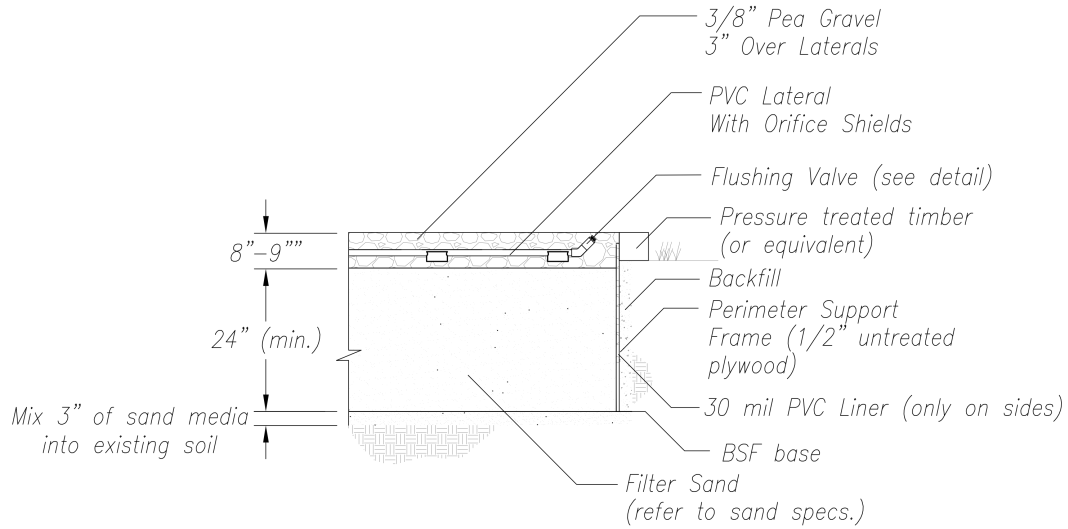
SIDE VIEW DETAIL – TYPICAL BOTTOMLESS SAND FILTER
